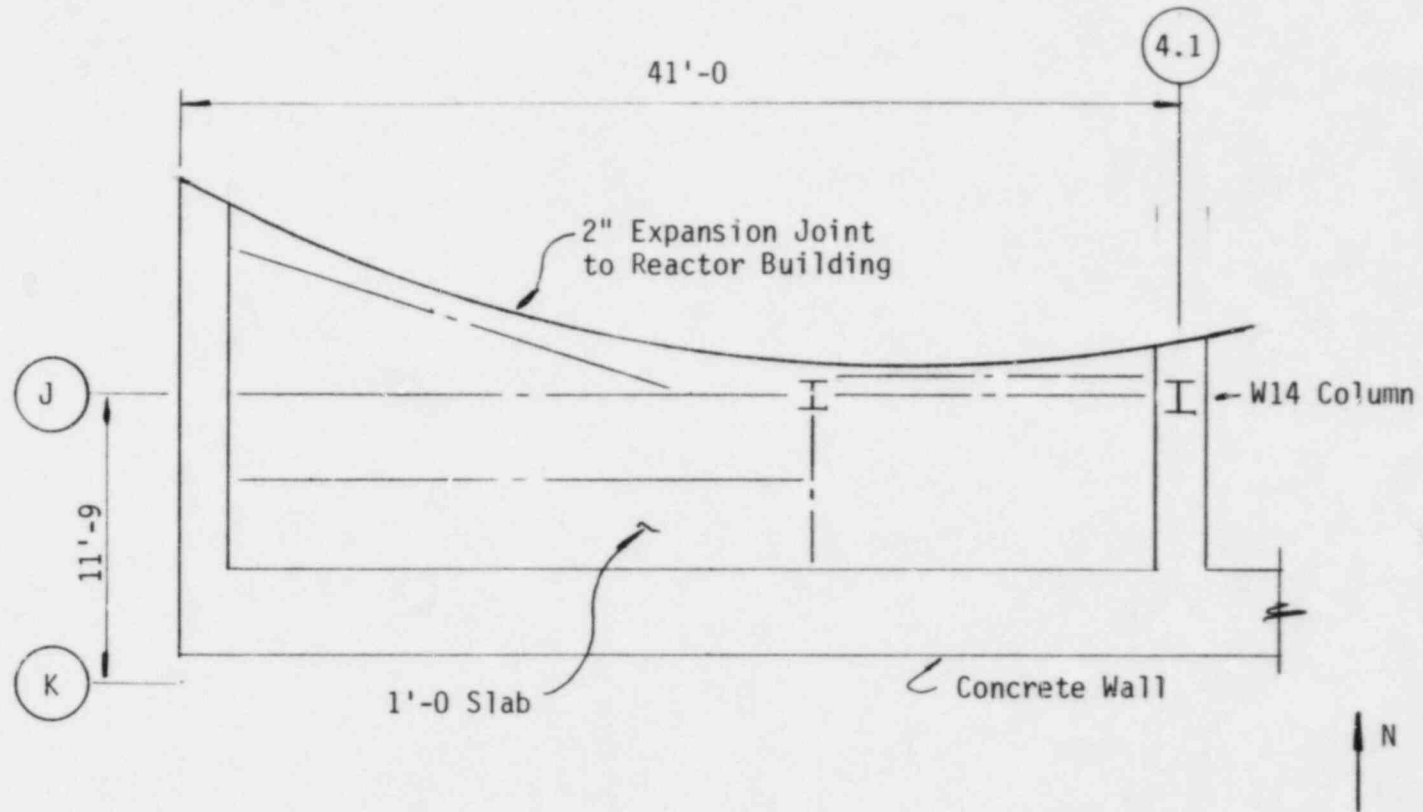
AUXILIARY BUILDING FLOOR AT ELEVATION 642'-7 (WEST ELECTRICAL PENETRATION WING)
